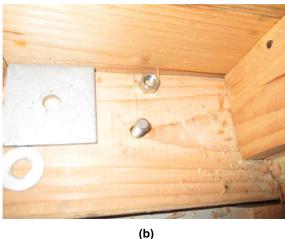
Anchor bolt and surrounding foundation sill plate.
